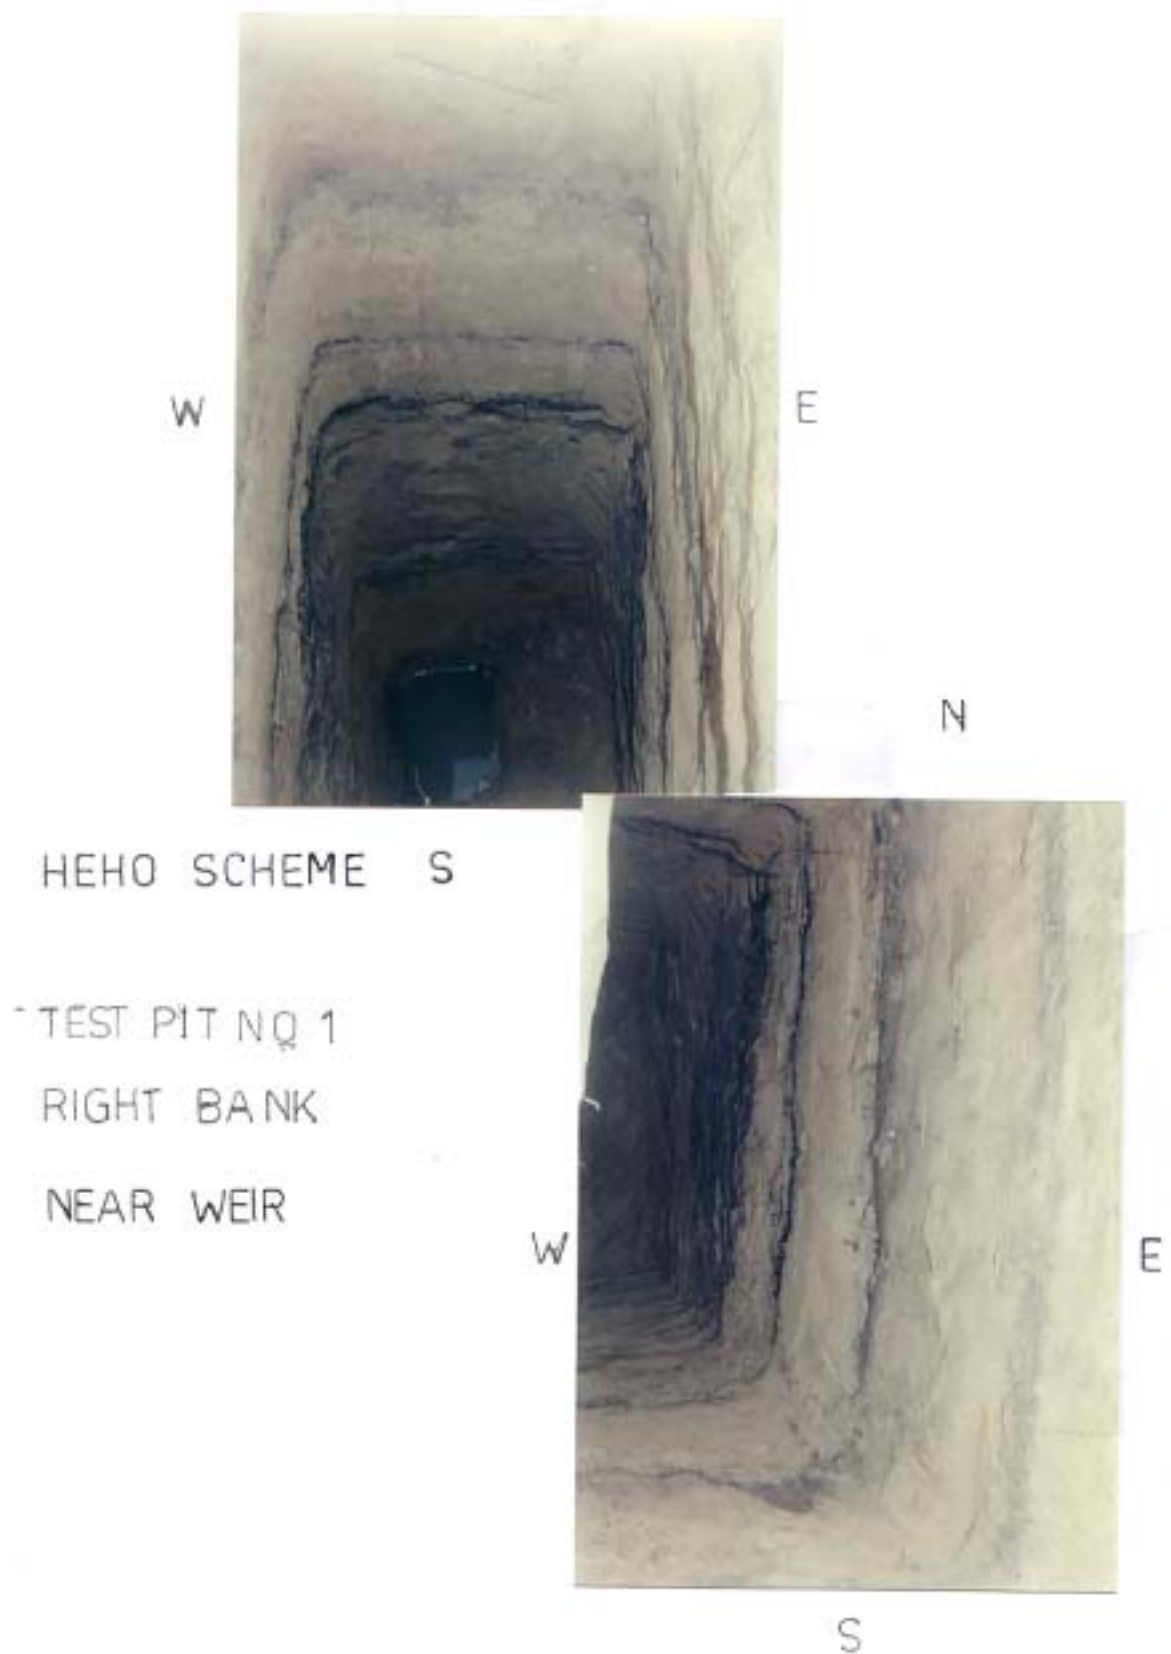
Photograph of Right Bank Test Pit No.1 (1/3)
